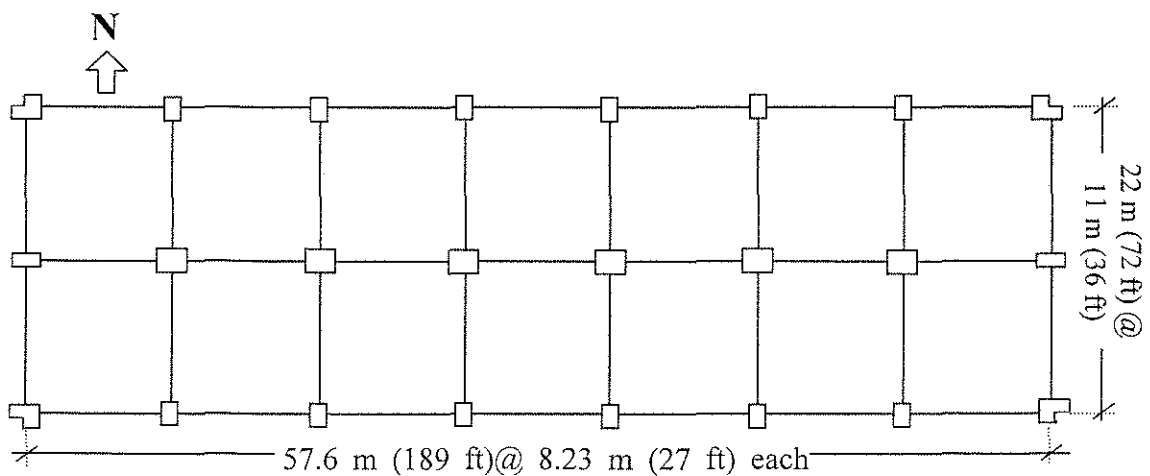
Typical Floor Plan (2nd floor to roof)
